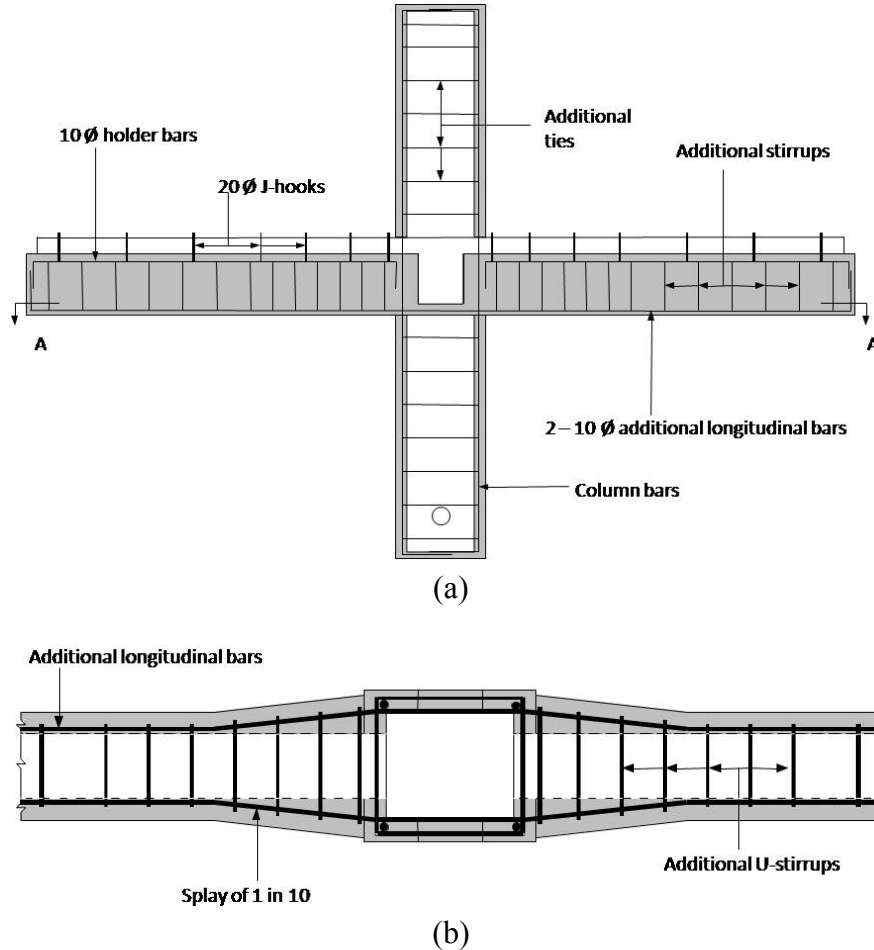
Sectional details for retrofitted sub-assembly specimens: (a) sectional elevation, (b) section A-A
